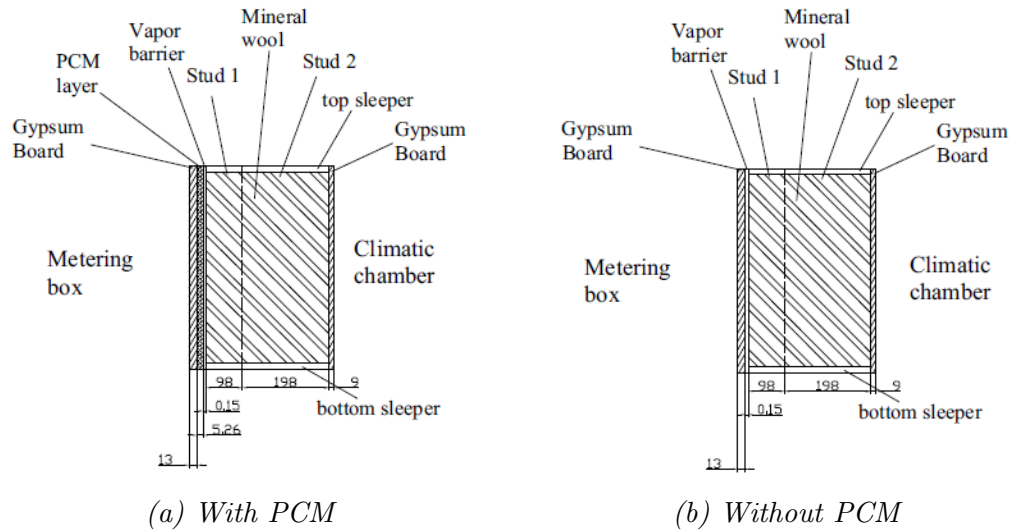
Cross section of the tested wall in the hot box (Cao et al., 2010)
